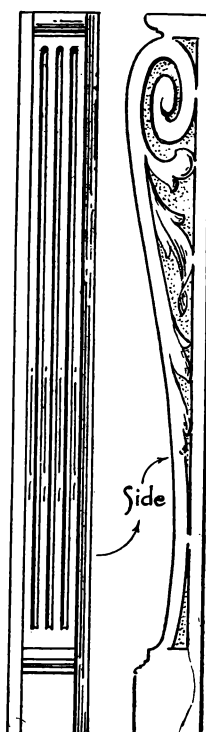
SHAPED TRUSS: FRONT AND SIDE.
